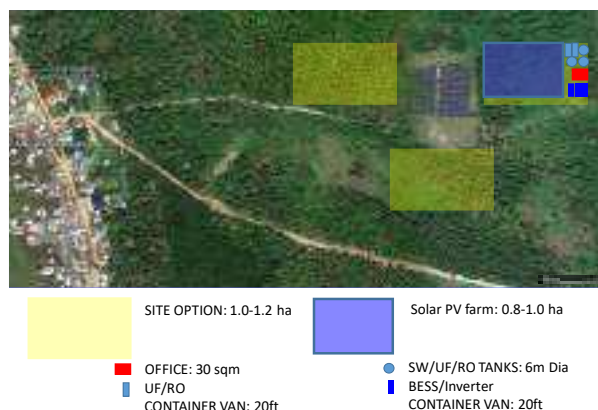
Site development plan for the desalination facility with additional 1 MWp solar PV system
